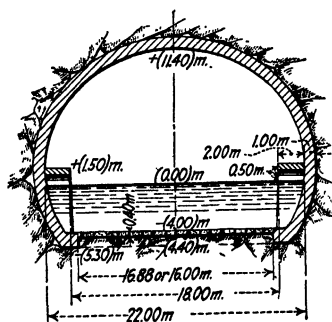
TUNNEL CROSS-SECTION, TYPE 3 OR 4.
